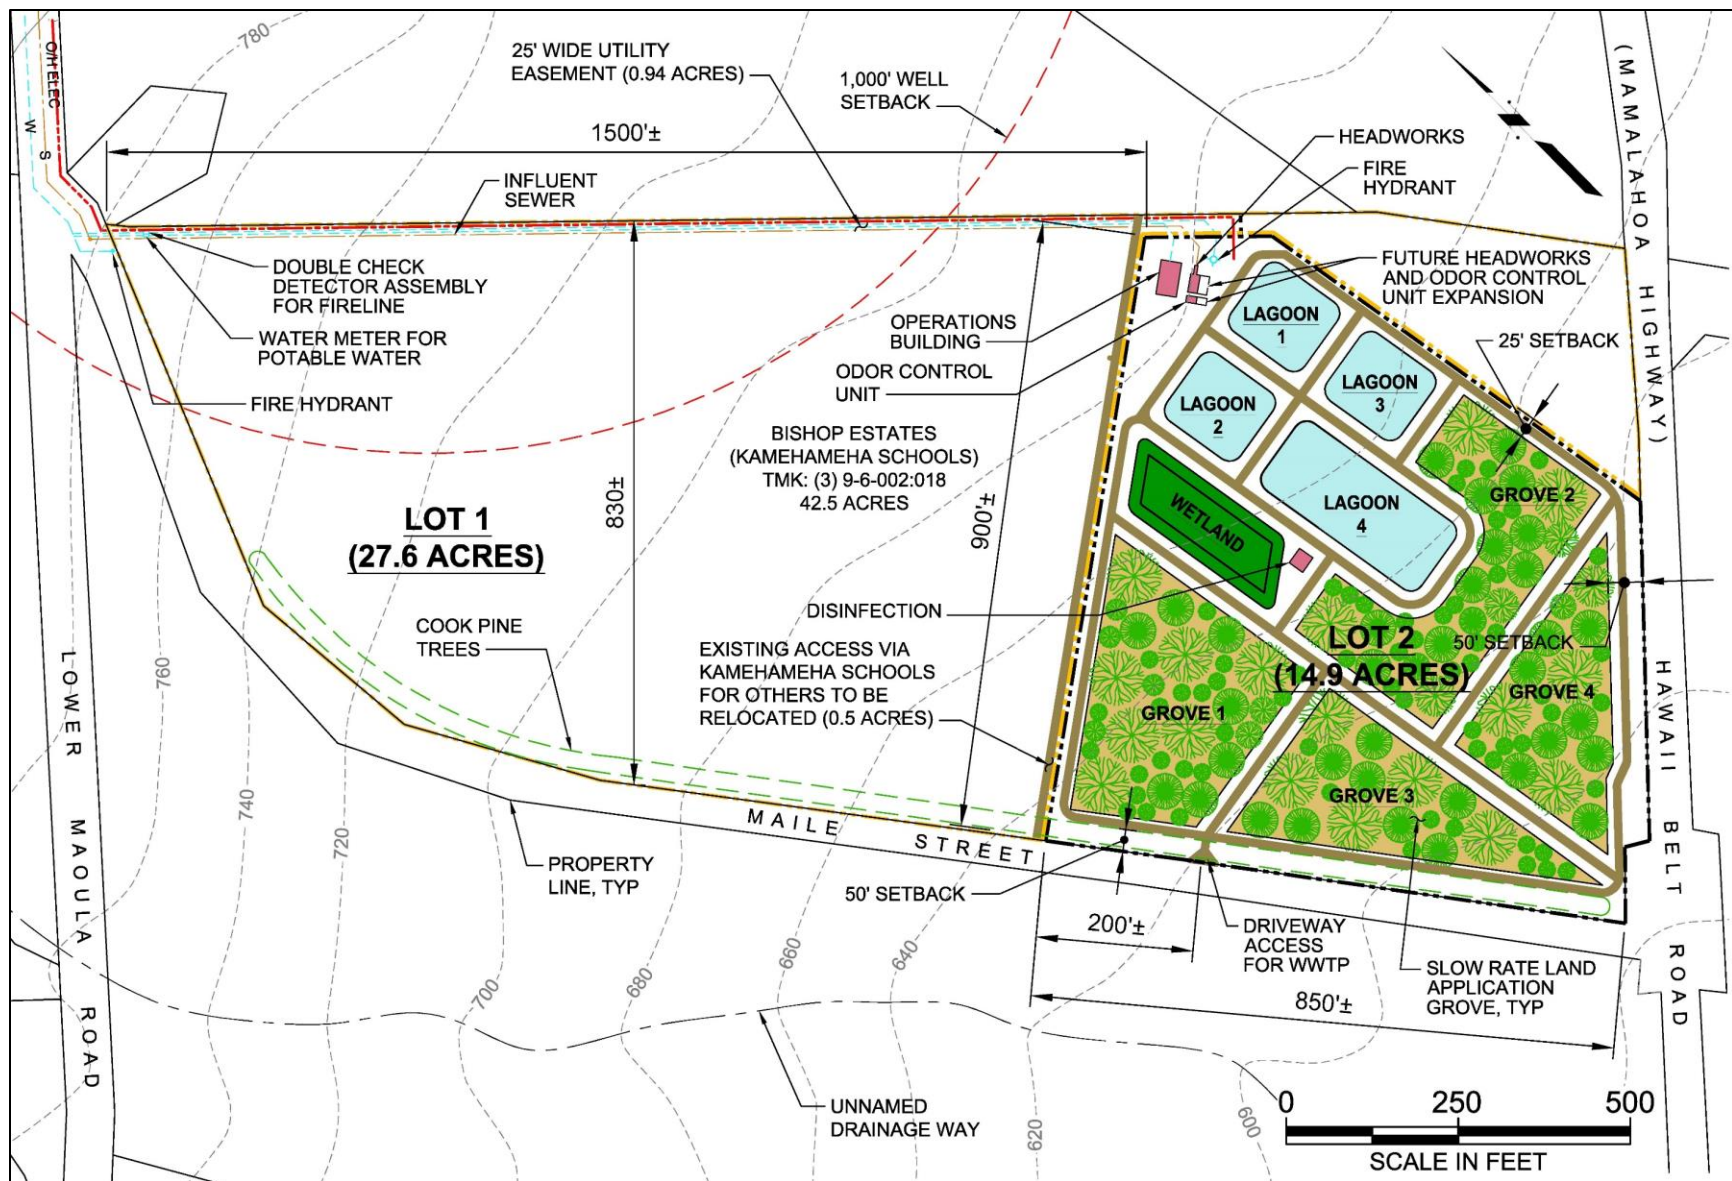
Preliminary Site Plan for New Wastewater Treatment and Disposal Facility at Site 7 (Preferred Alternative)
